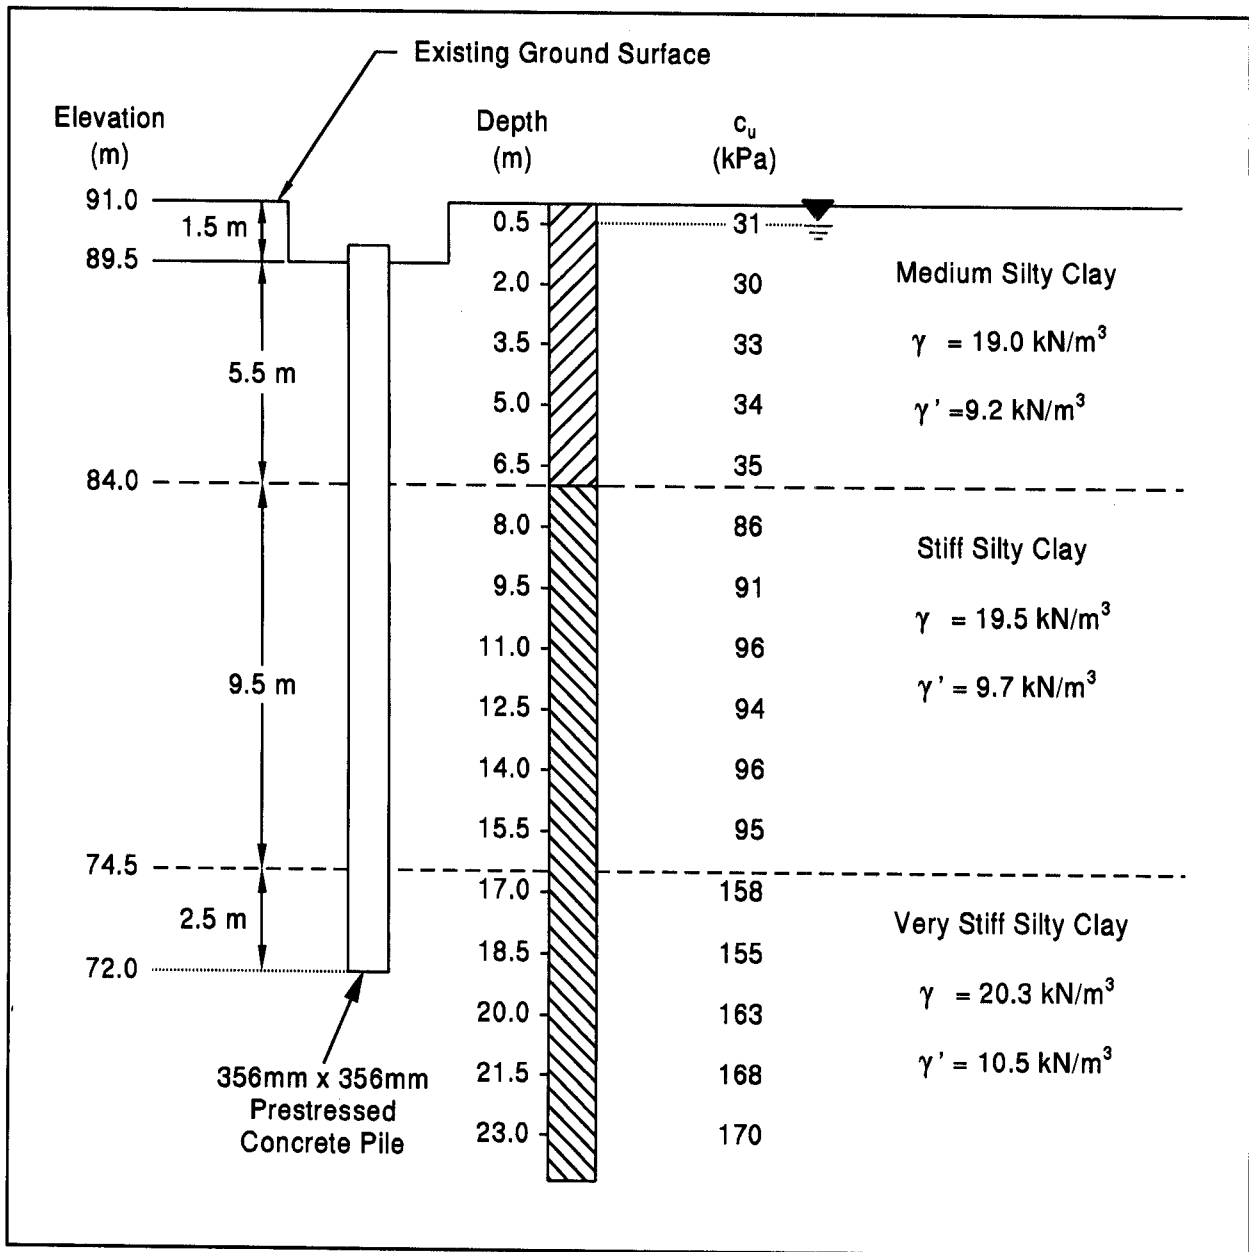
Interpreted Soil Profile from Soil Boring S-4 at the South Abutment
